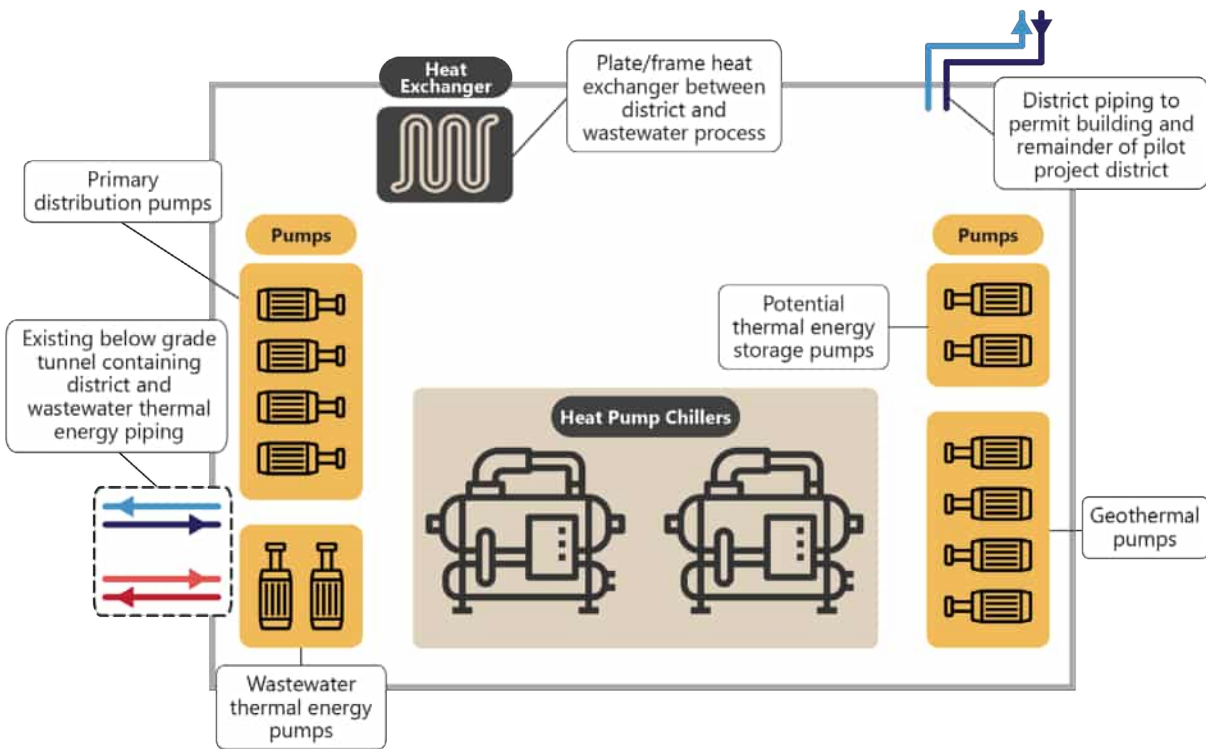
Proposed layout of Cherokee Street Central Utility Plant
